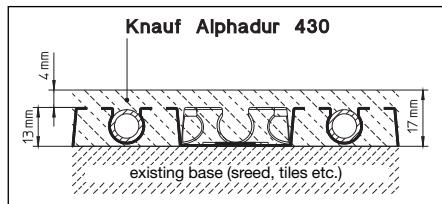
Knauf Alphadur 430 (minimum covering 4 mm, total structural height 17 mm)
